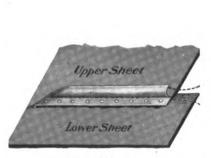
B Fig 4181A A flexible layer of Carey's asphalt cement composition rolled under enormous pressure, between a woolen felt and a strong Calcutta burlap. An asphalt composition is imbedded into the meshes of the burlap, at the factory, which renders painting of the
